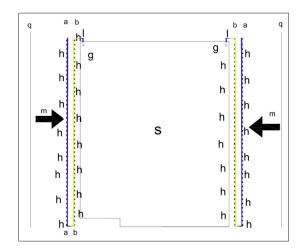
plan of a damping barrier placed on two opposite sides of a building.
